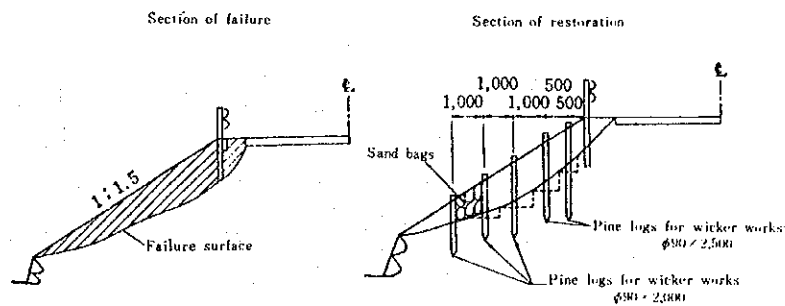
(a) An Example of Restoration of Slope Failure due to Surface Water From Road Site
